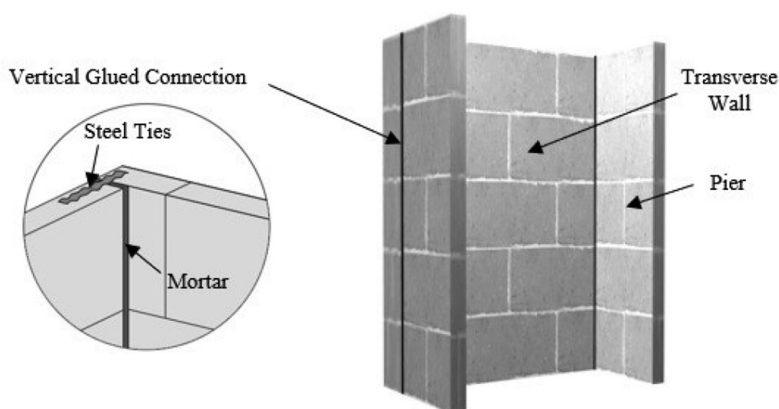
Pier-main wall system with calcium silicate elements and continuous vertical connections (Fusco et al. 2022).
